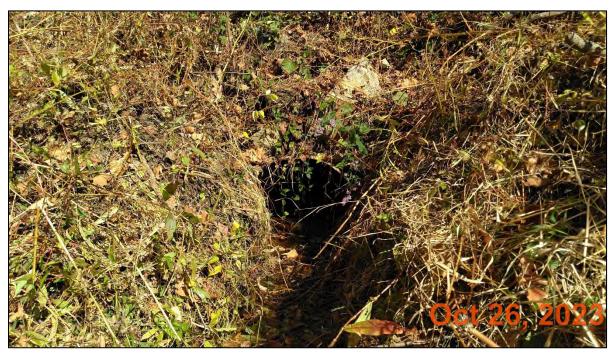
, facing downstream Caney Fork Road culvert, Reach 1D.
